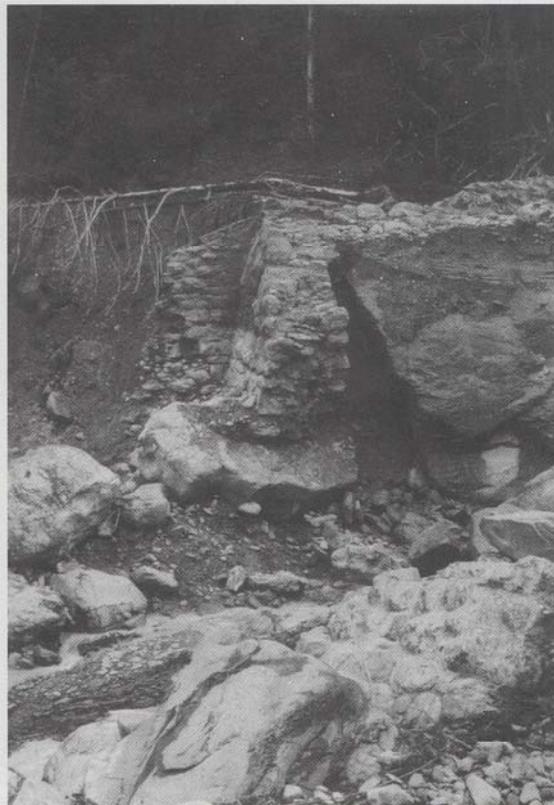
Check dam destroyed in the Barranco de Arás gorge. The large boulder on which the dam was founded was undermined and displaced. Flooding waters partly eroded the ground behind the abutment. Some infill deposits are still visible upstream the dam (right).
